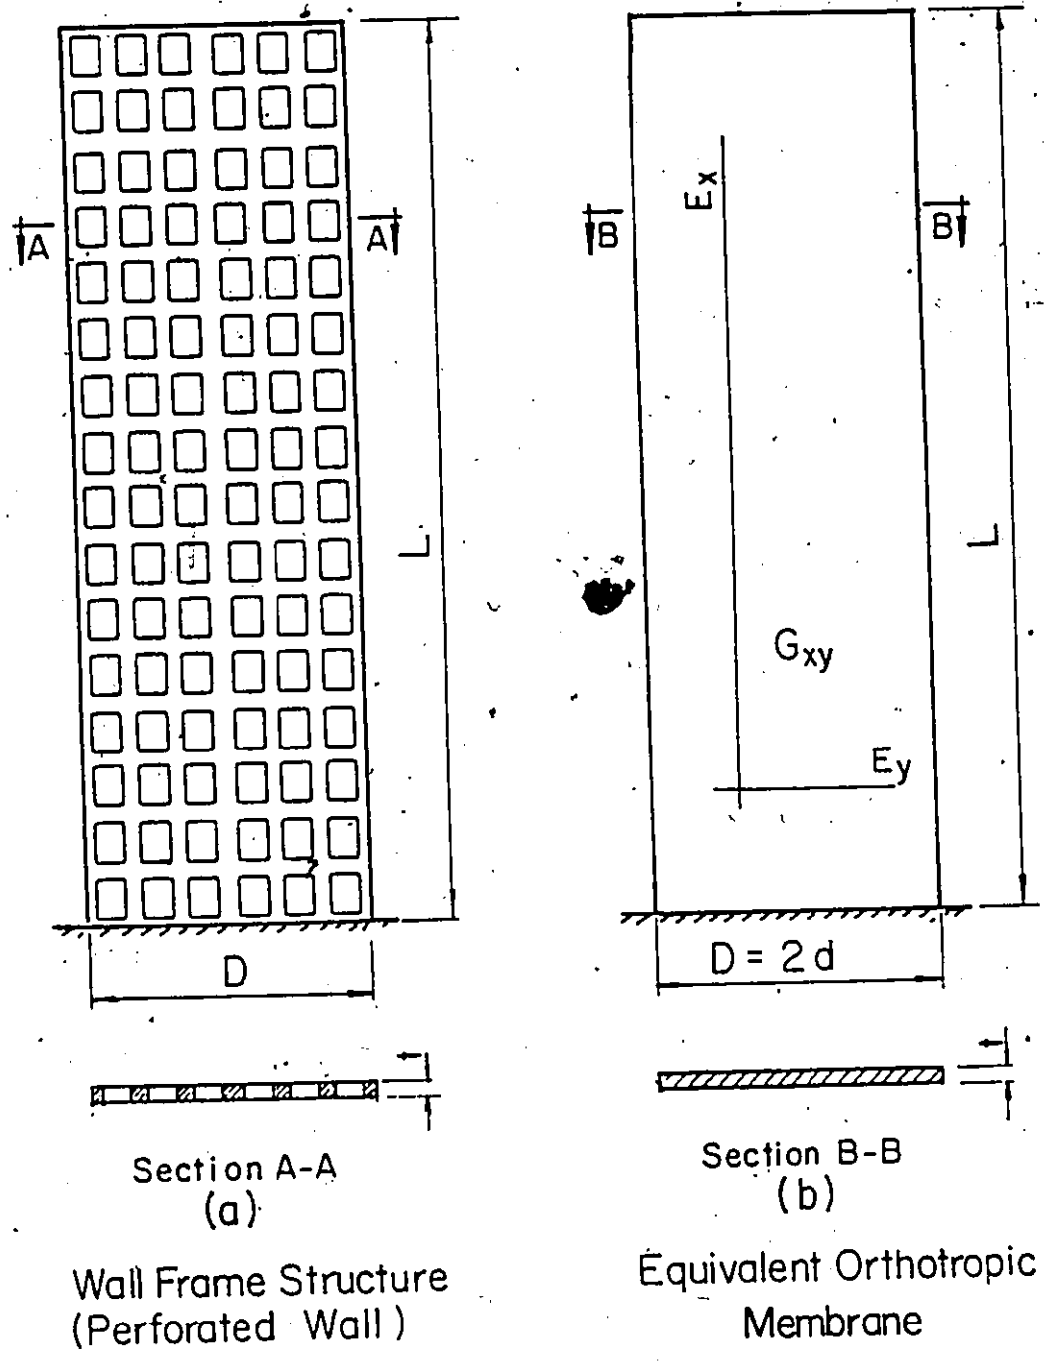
| MODELLING OF WALL-FRAME STRUCTURES
